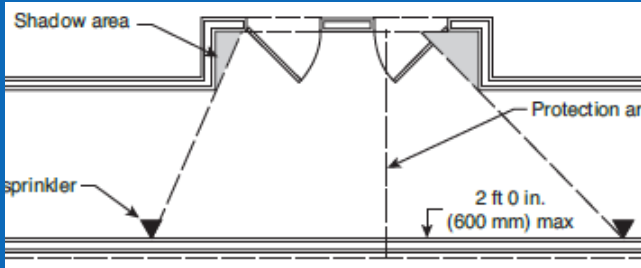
Positioning of Sprinkler to Avoid Obstruction (Extended Coverage Sidewall Spray Sprinklers).
